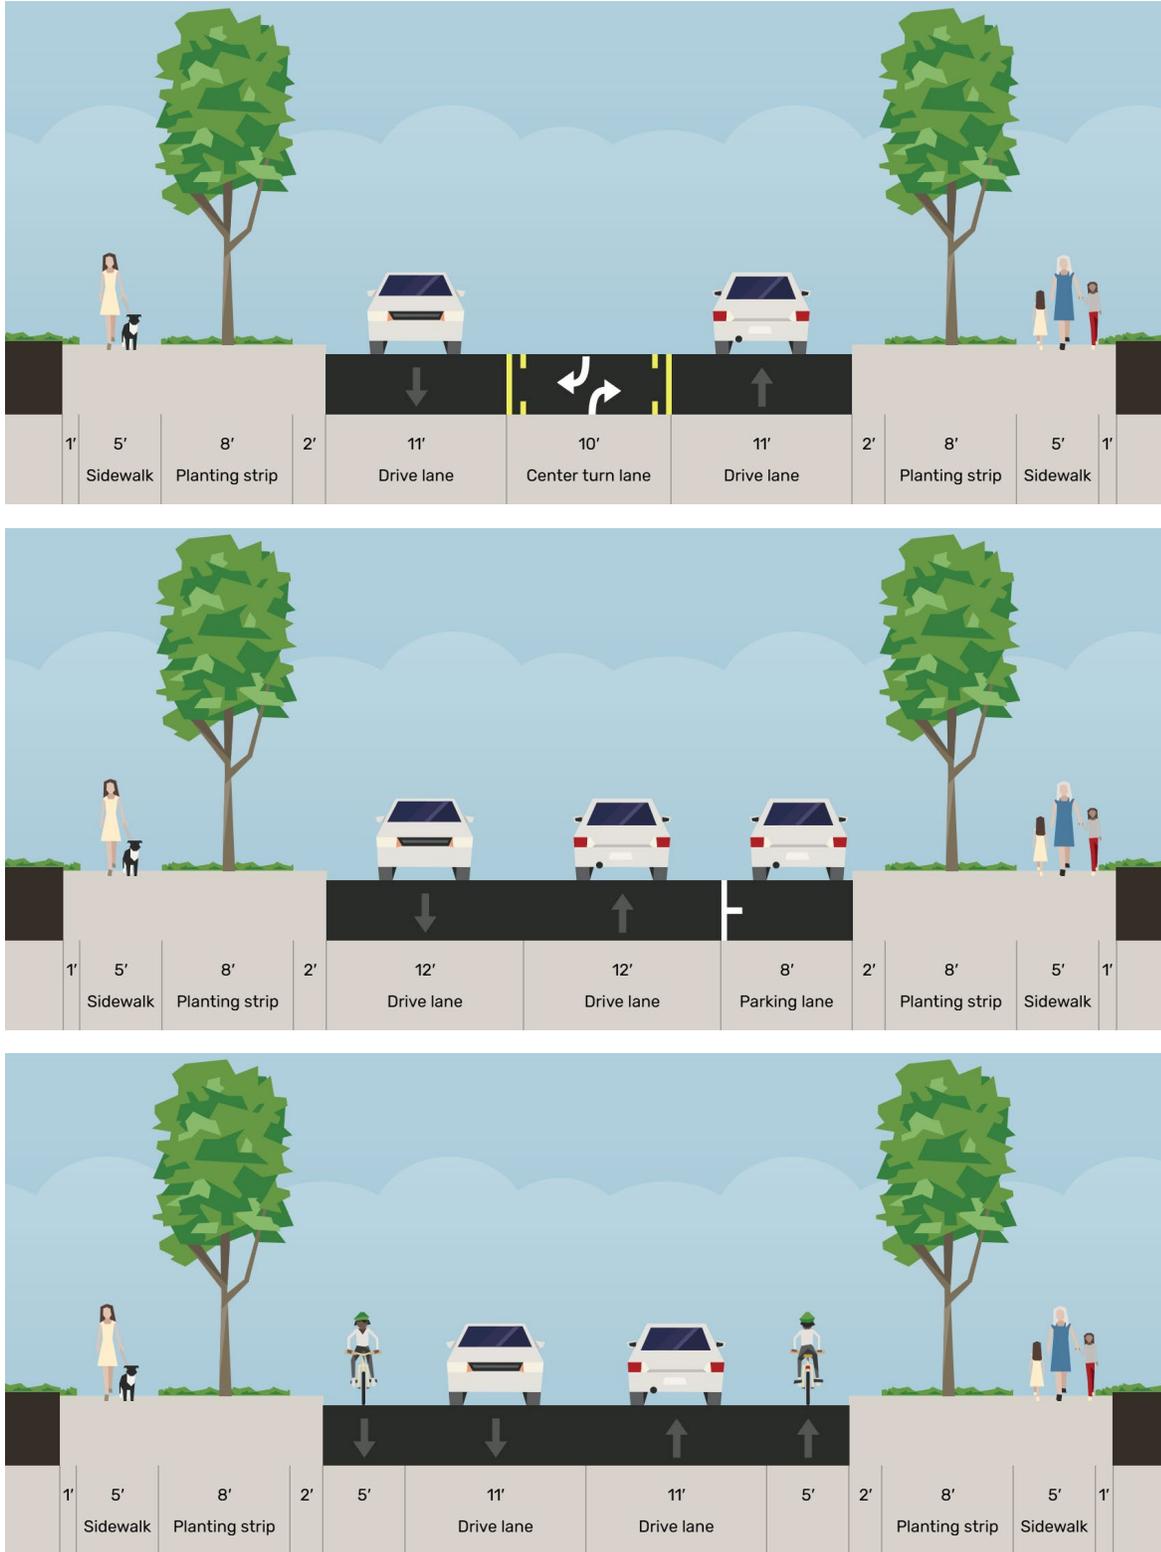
64-Foot Right-of-Way / 32-Foot Paved Typical Sections (Collectors)
